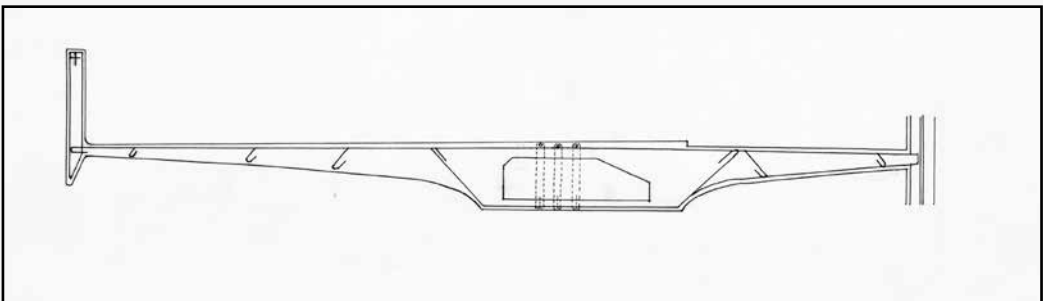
The section of the sundeck slab shows a schematic drawing of the reinforcements. The image was made afterwards for presentation purposes. Drawing No. 50-409. The drawing has been edited. AAM.
